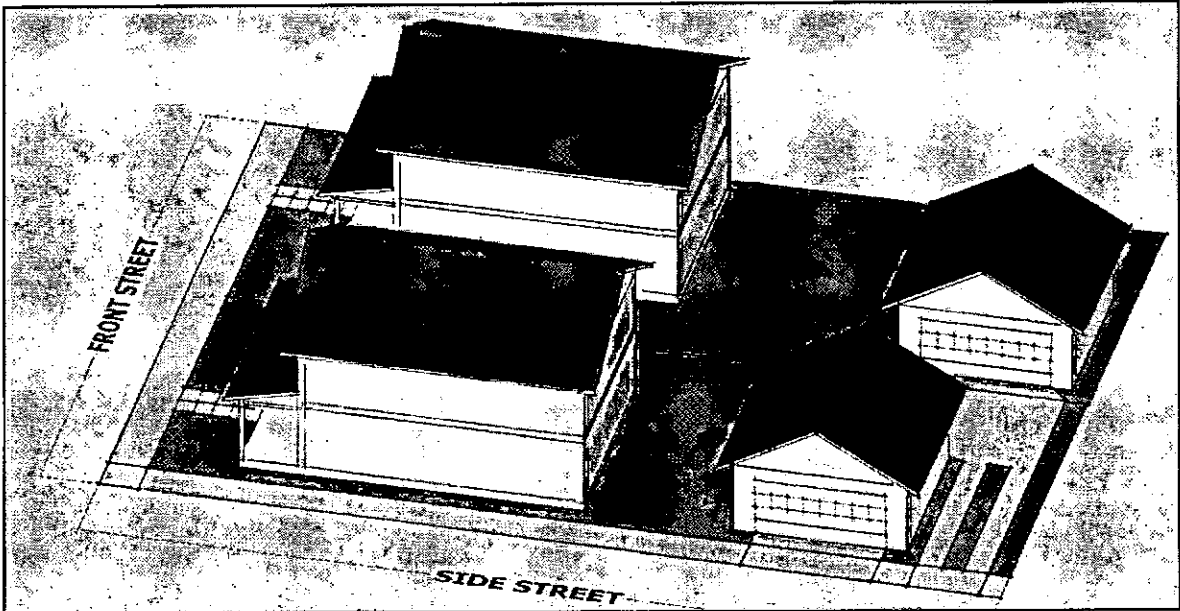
Example Providing Access to Side Street via Easement/Lot Configuration
